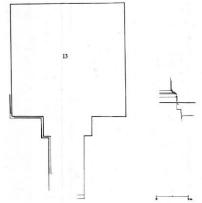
Stupa 13: Plan with detail of the podium's moulding (Drawings by FM).
